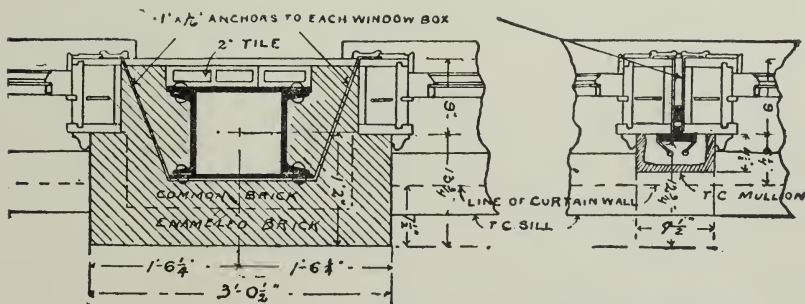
Plan of Piers and Mullions in Alley and Light-court,
